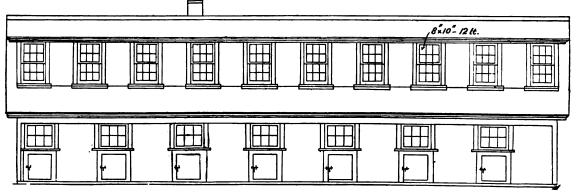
AN EXPERIMENT STATION HOG BARN (SOUTH ELEVATION).
